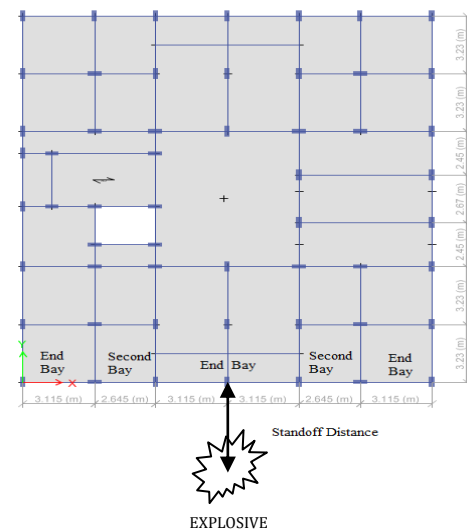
Typical location of explosive along Face 1(F1) & typical layout of Regular Building
